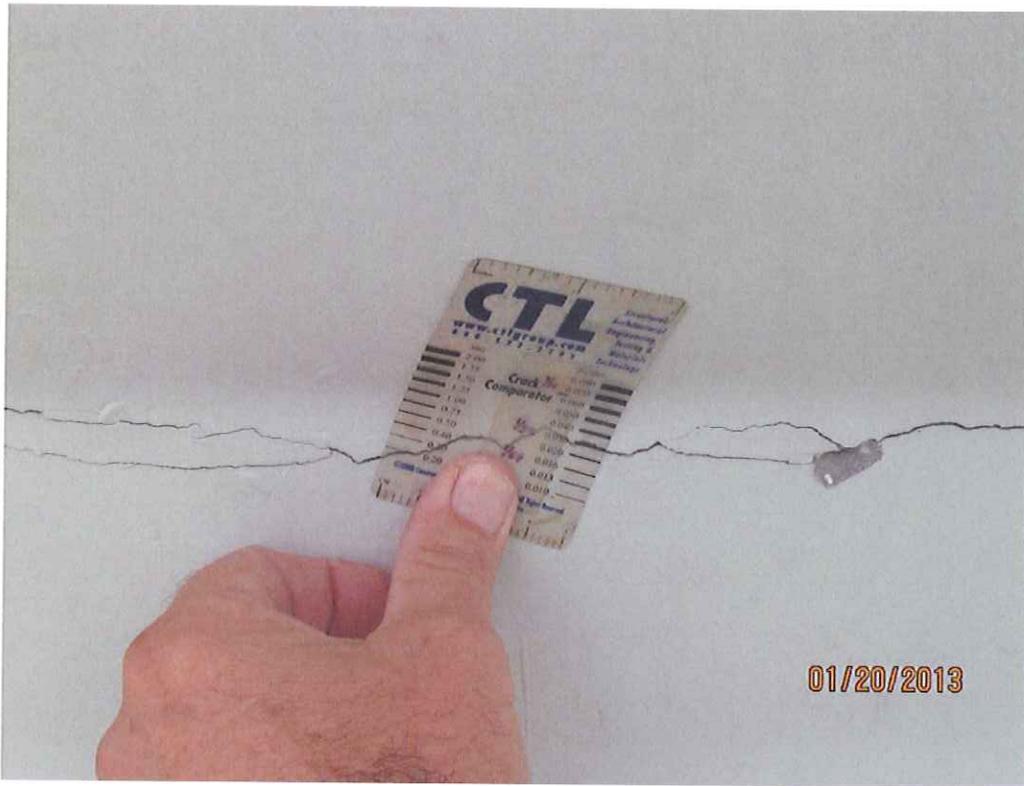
Longitudinal crack along east face of Beam 8-4 at web to top flange juncture
